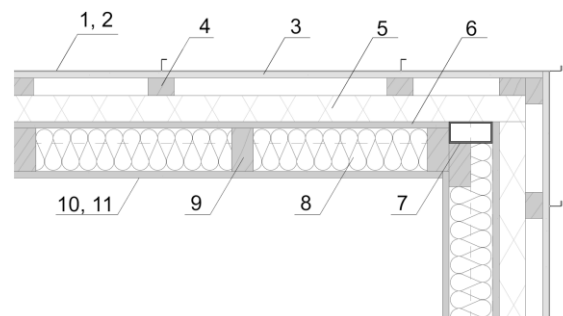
External wall structure – metal panels paneling: 1- Metal panels, 2- Anti-condensation sheet, 3- Support chipboard; 4- Ventilation batten, 5-Rigid thermal insulation - polyurethane foam 60 mm, 6- Chipboard, 7-Metal structure, 8- Rockwool thermal insulation 100mm, 9- Wooden structure, 10 – Vapor barrier membrane, 11-Gypsum wall board.
